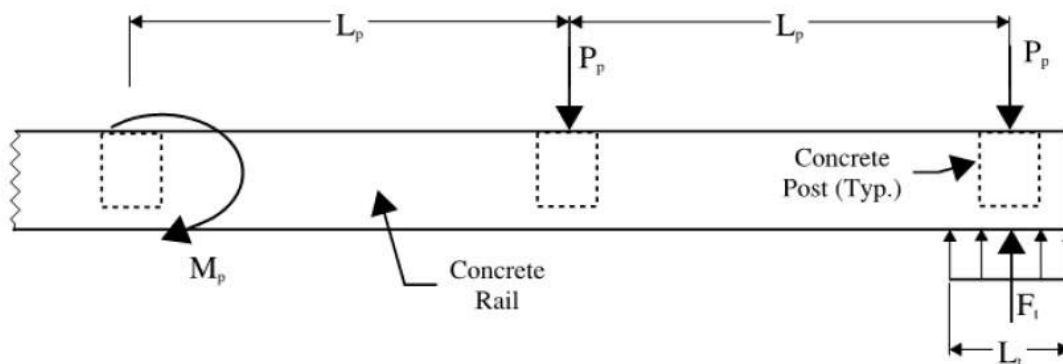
Two-Span Failure Mode for Post-and-Beam Railings at an End Section or Joint
